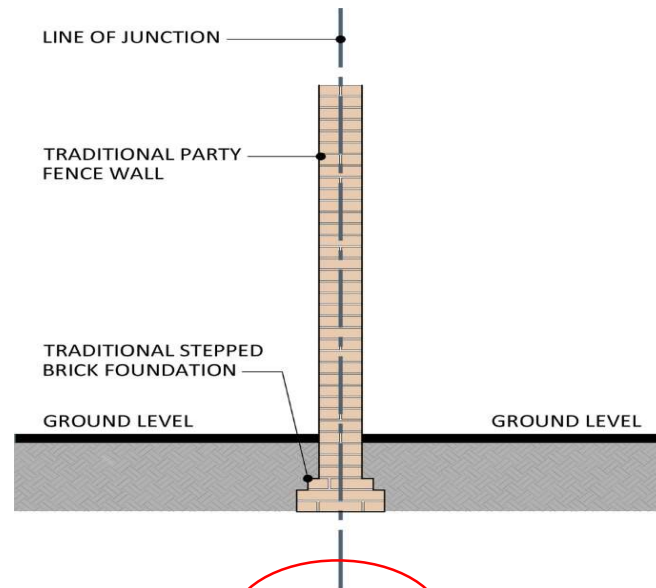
Sketch detail of traditional brickwork spreader foundation (Shutterstock, 2017)
